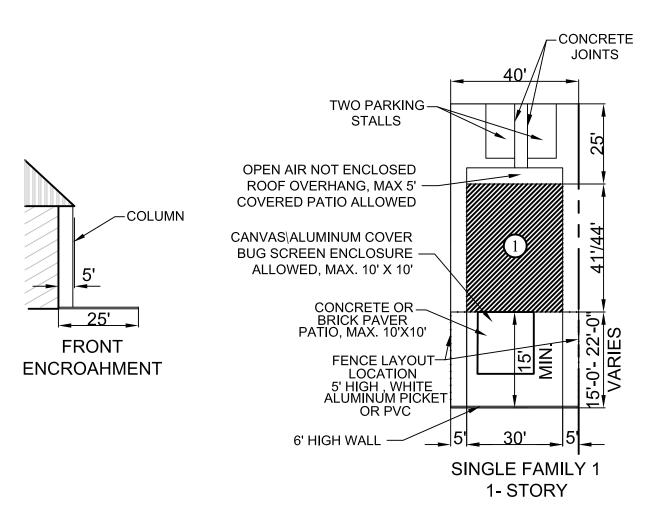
EXHIBIT F TYPICAL RESIDENTIAL PLAN
